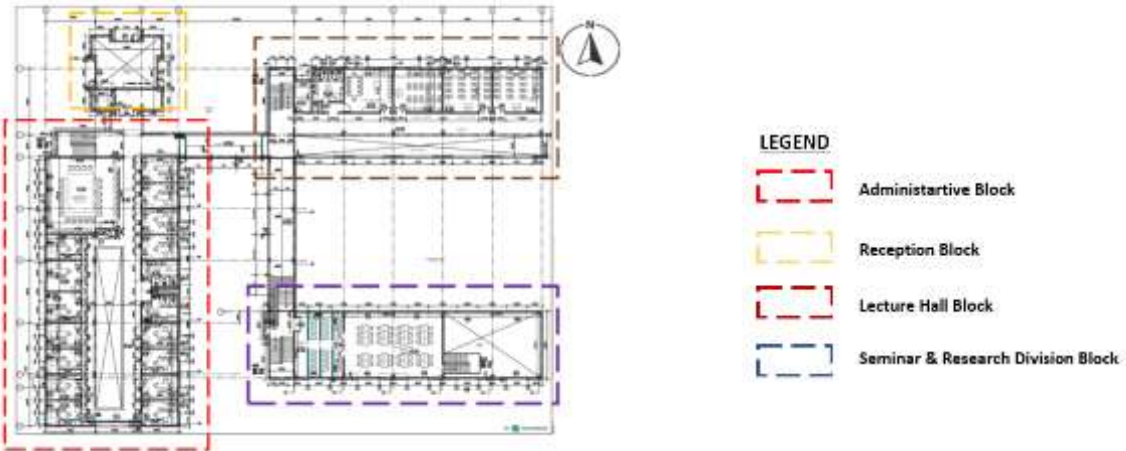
First floor Plan of Frank & Debbie Islam management complex, A.M.U.
